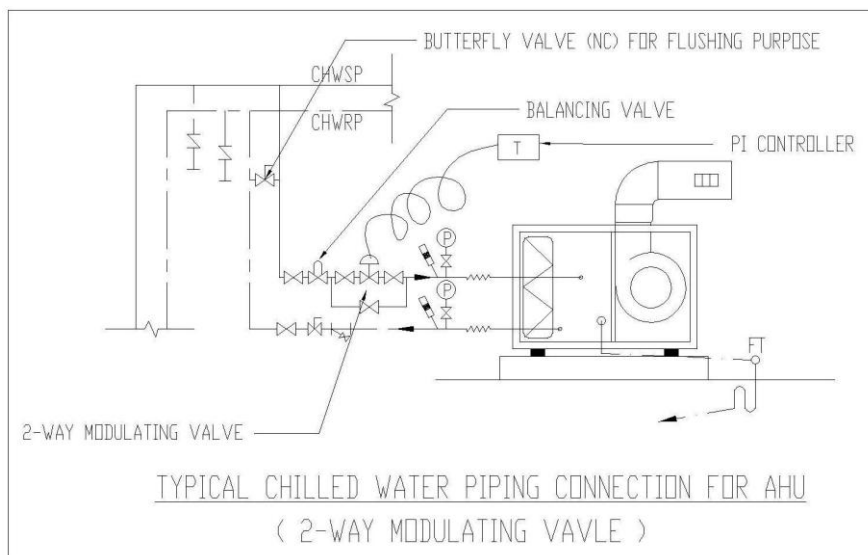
Typical chilled water piping connection of AHU installed with 2-way modulating valve
